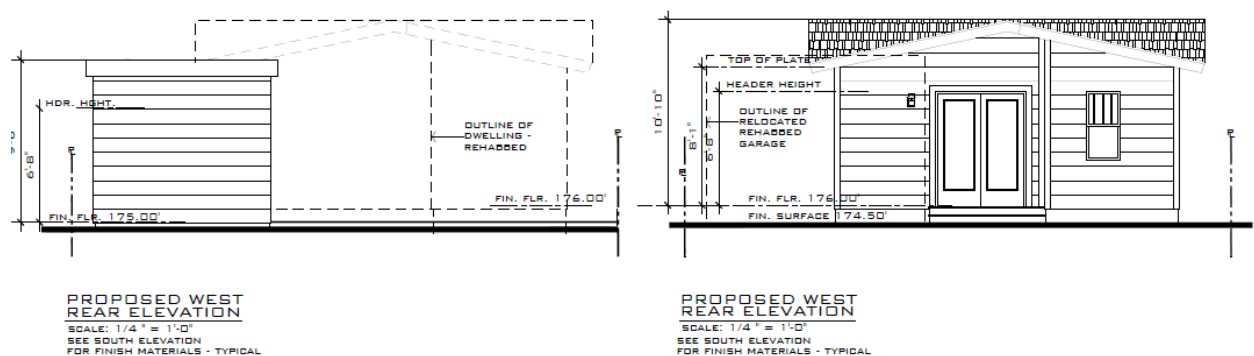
Proposed rear (west) elevation. Source: Source: Architectural Design Solutions, "Regalado Remodel," Sheet A-6. November 19, 2024.
